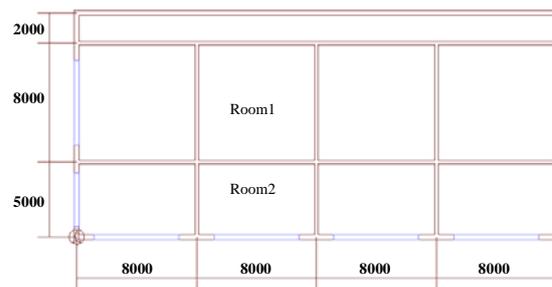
Layout plan of the Case Study Building (Unit: mm)
